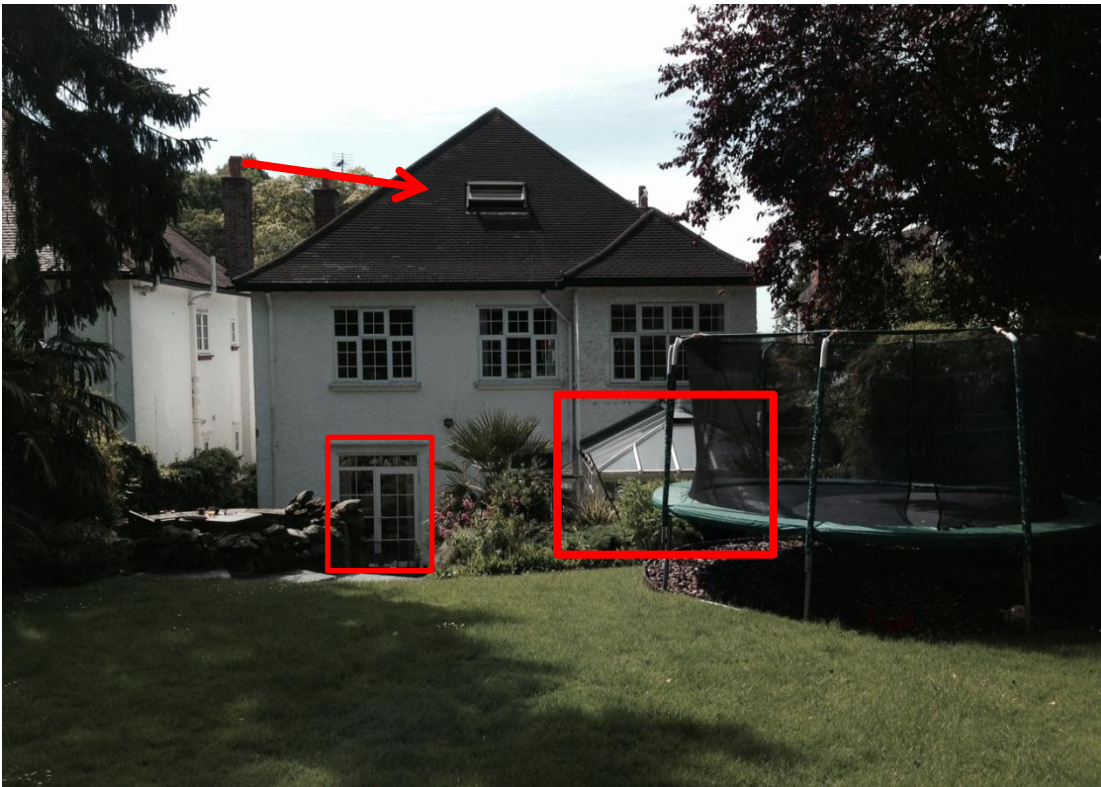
Existing rear elevation with arrow showing location of new dormer and rear extension and one set of doors to be replaced
